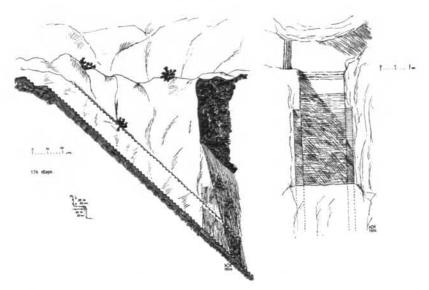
Bairam Tepe. Cross-section and plan of the tunnel
